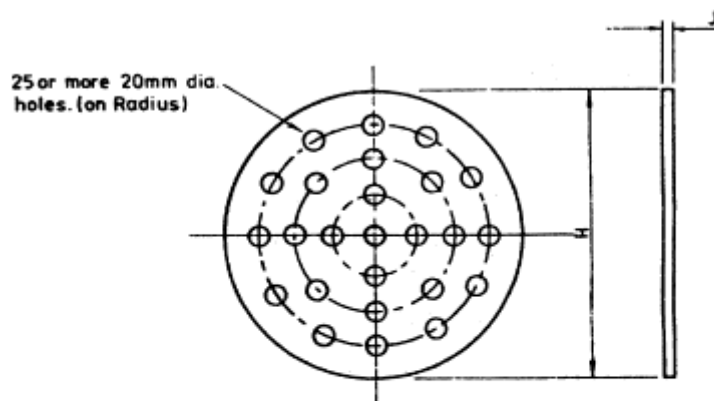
SAND/PLASTER TRAP CONSTRUCTION NOTES
